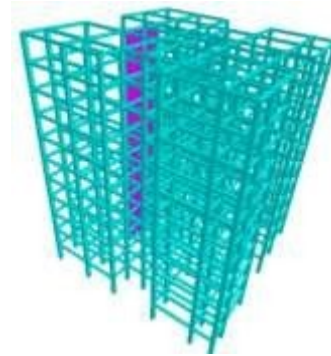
G+10 RCC Shear Wall Structure with different shear wall location
